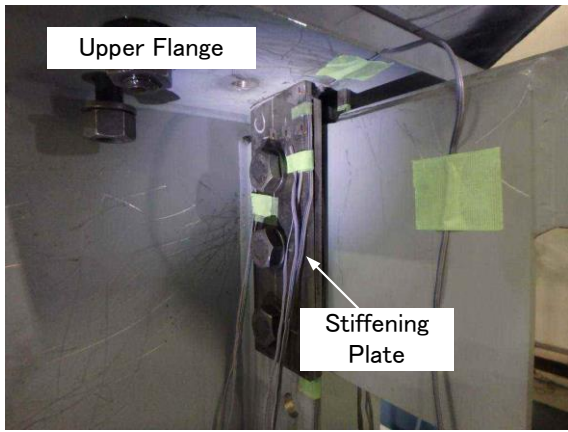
Stiffening Plate Retrofitting Method Using a Jack-up Jig
